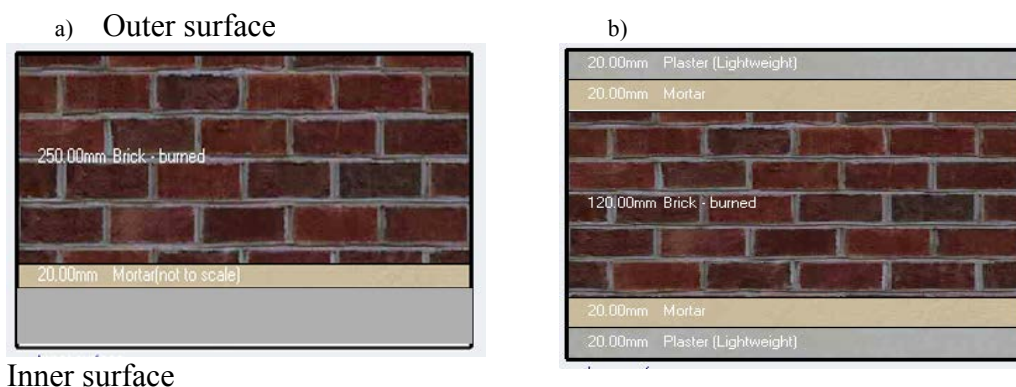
Wall sections used, (a) exterior wall and (b) internal wall/partitions
